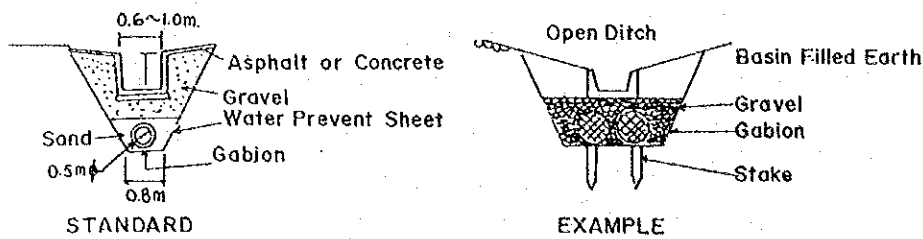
CLOSED CONDUIT WITH OPEN DITCH
